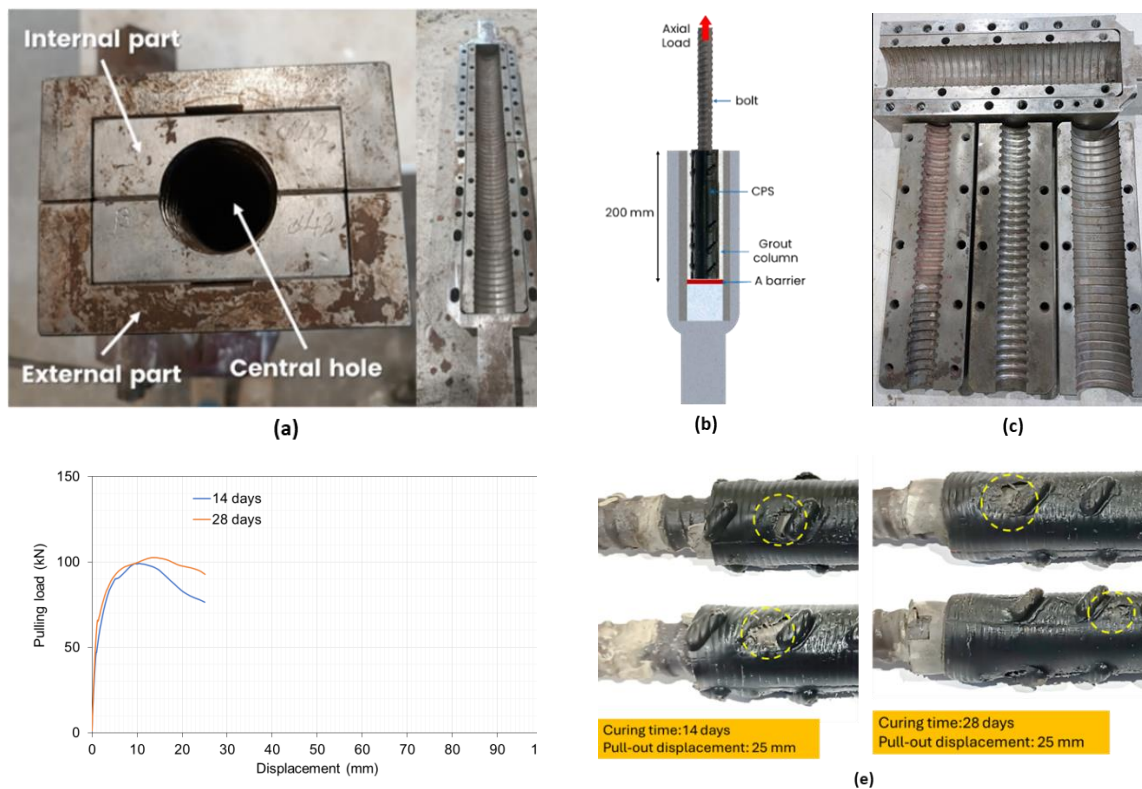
(a-d) Variable diameter steel split set Apparatus, (b) Pull test arrangement of the sleeved bolt, (c) multi-diameter internal section half holes, and (d) Load displacement of bolts in 14 and 28 days of sleeve installations. c) Pull Testing of Bolts in Concrete Cylinders
